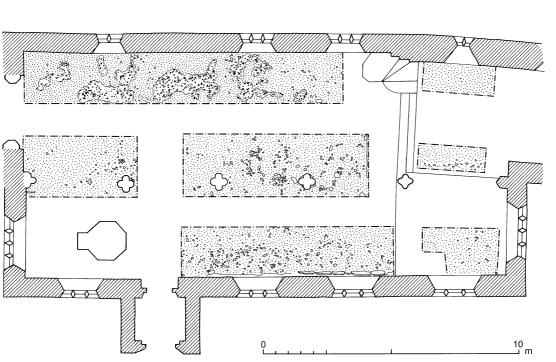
Minster church: plan of excavated areas (drawing: J Read)
